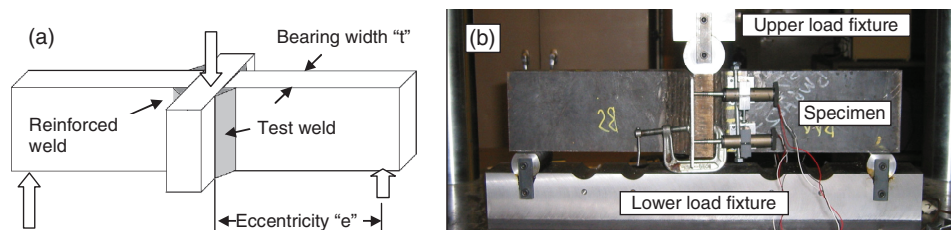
Cruciform joint bending specimens: (a) schematic and (b) photograph of test setup.
